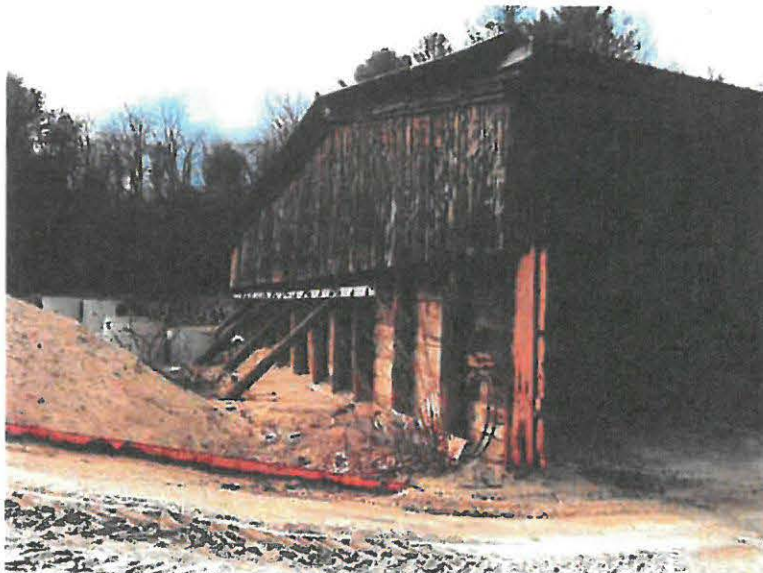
Franklin 211 – Sidewall starting to blow out and temporary braces installed.
